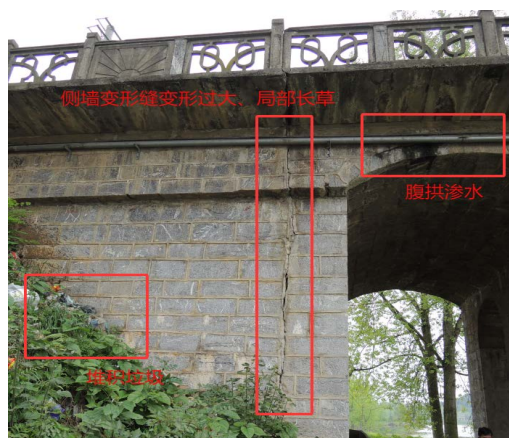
Water seepage on the side wall, excessive deformation of the deformation joint
